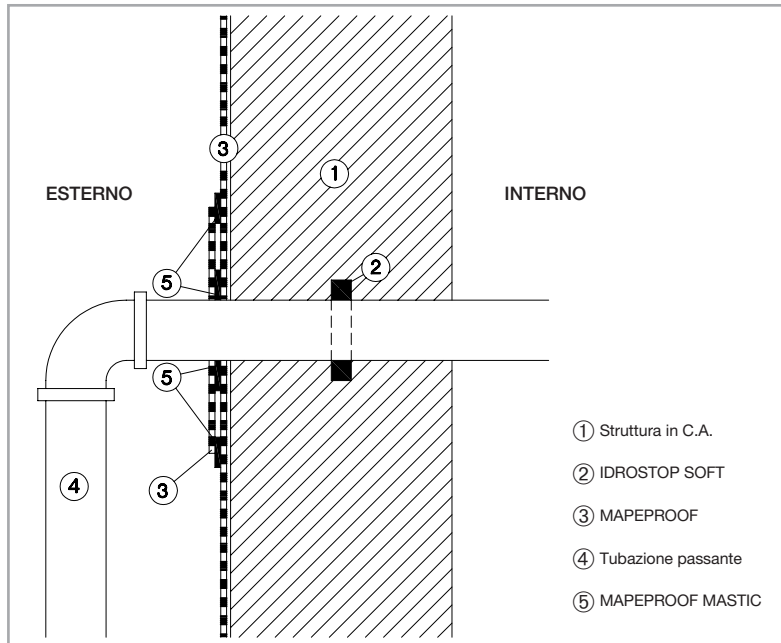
An example of how to seal a through pipe with a ring of IDROSTOP SOFT bonded with ULTRABOND MS RAPID and MAPEPROOF bentonite sheet trimmed to the shape of the pipe
